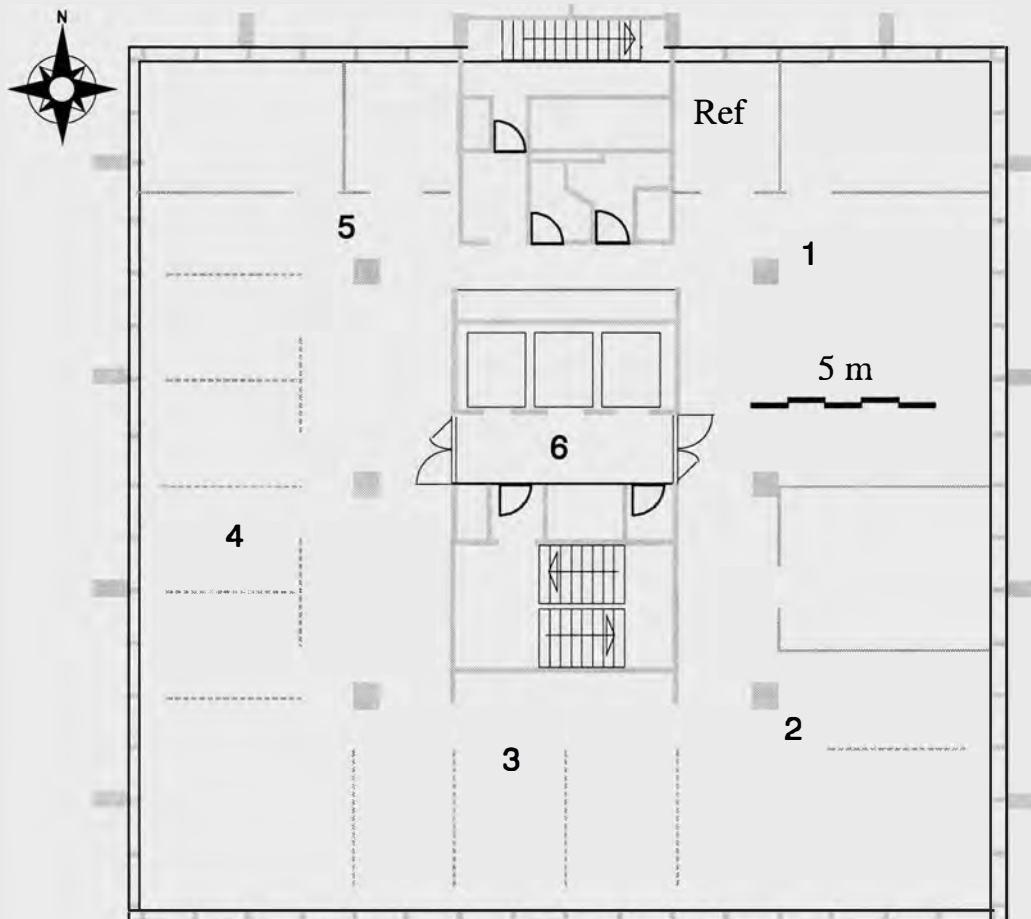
Building A: plan of tenth floor. Numbers are measurement locations during the European IAQ Audit. Other floors in tower are similar to this one.
